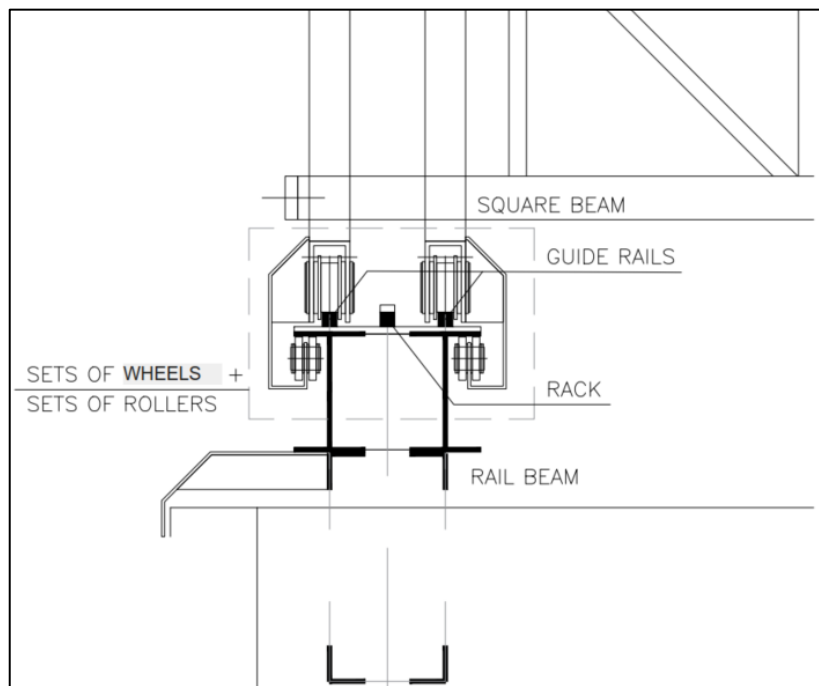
Wheels and Rollers Typical Assembly on the Rail Beam
